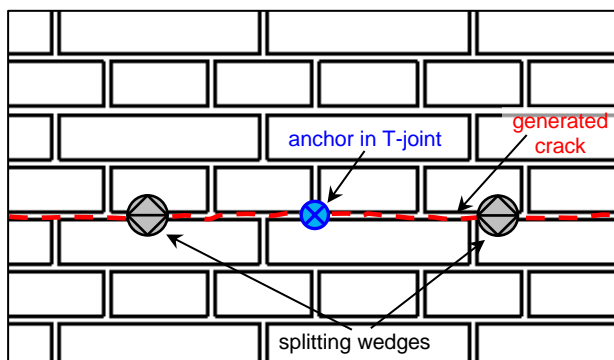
Horizontal crack, placement of wedges and anchor location for seismic testing
